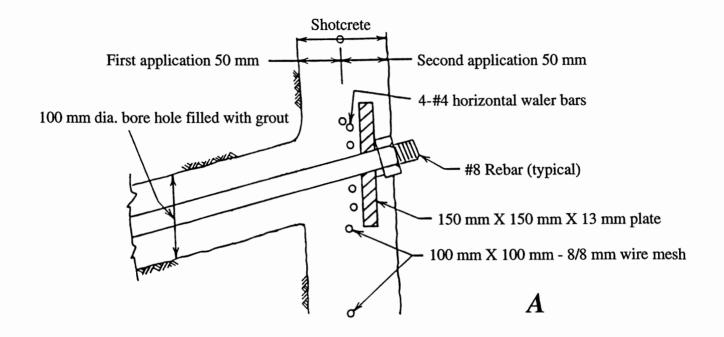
Cross section of a soil-nailed retaining wall constructed on a steep hill in San Francisco (CVA wall), Calif., to provide adequate space for an apartment complex (Felio and others, 1990).
